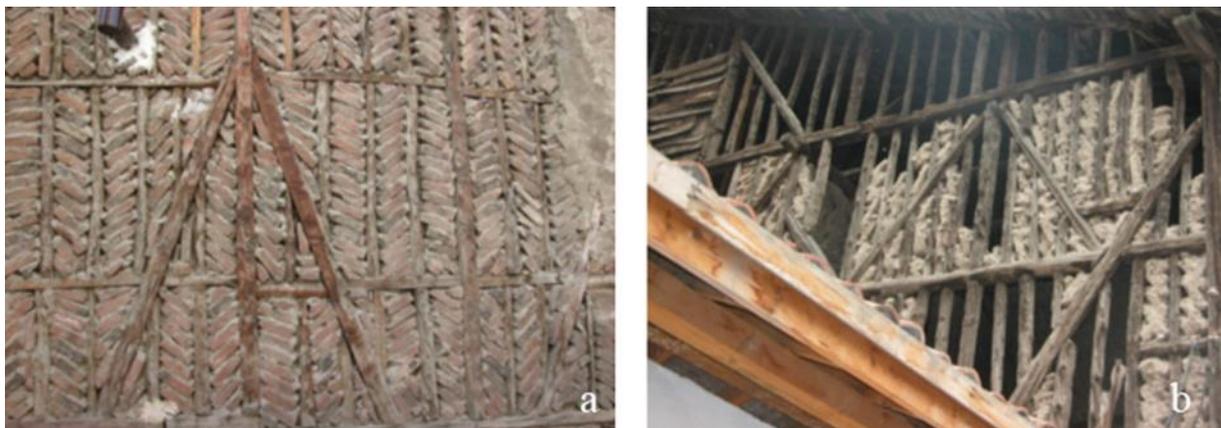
Structural system Photo a) Adobe-brick filling between timber frame b) Brick filling between timber frame [1]
